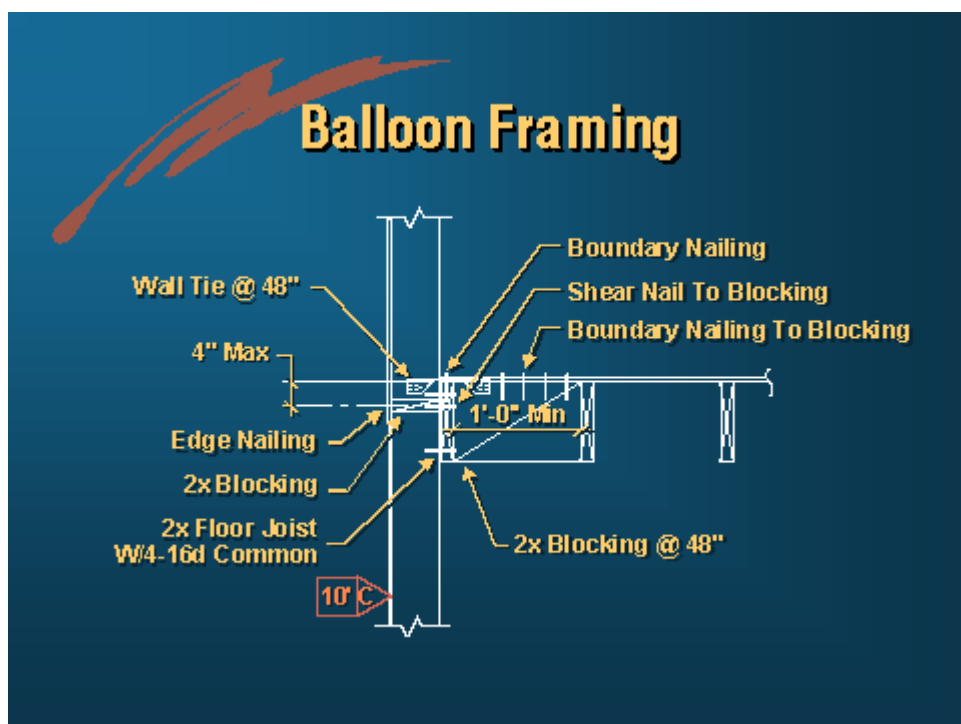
Typical balloon framing section detail. Notice the continuity of vertical elements. [76]
